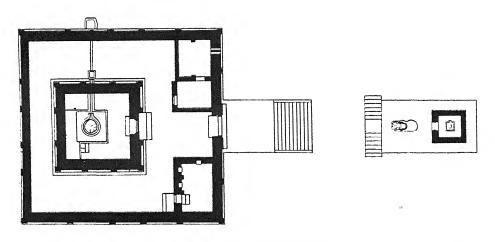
PLAN, TEMPLE, BILESVARA P. 59
